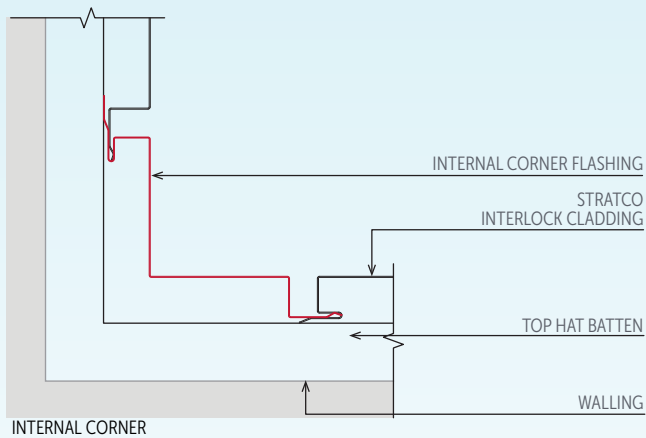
INTERNAL CORNER WALL FLASHING DETAIL (PLAN VIEW)
